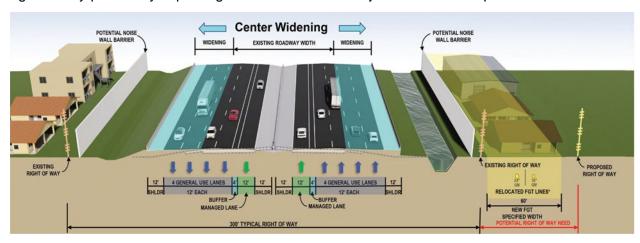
Typical Section Segment 2 - Build Alternative 2 - Center Widening
